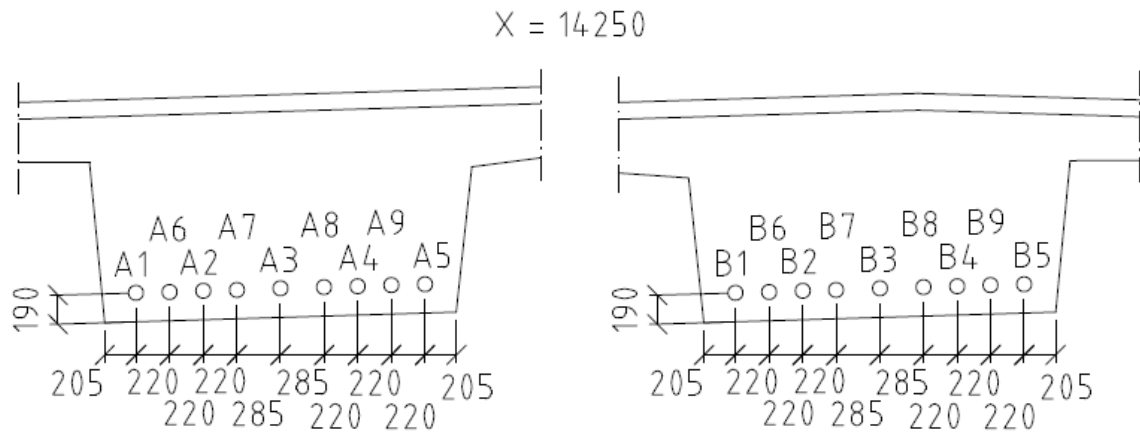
Plane figure of Särkijärvi Bridge from the construction plan.
